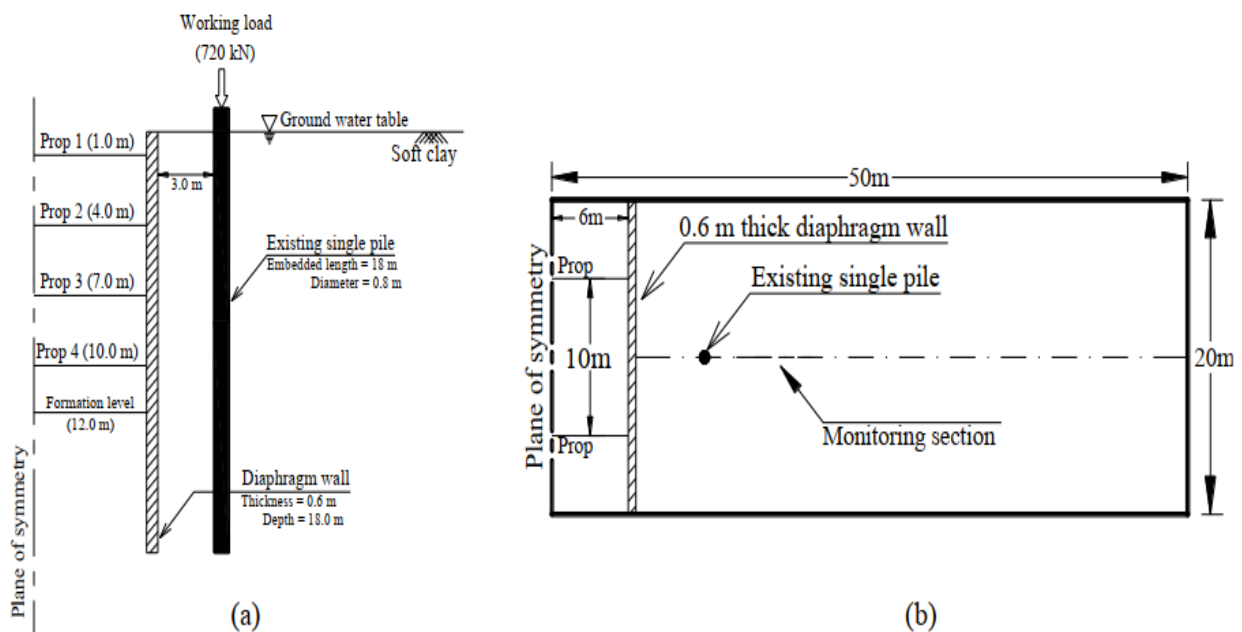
Typical geometry in Soomro et al. (2019b) analysis (a) elevation & (b) plan view
